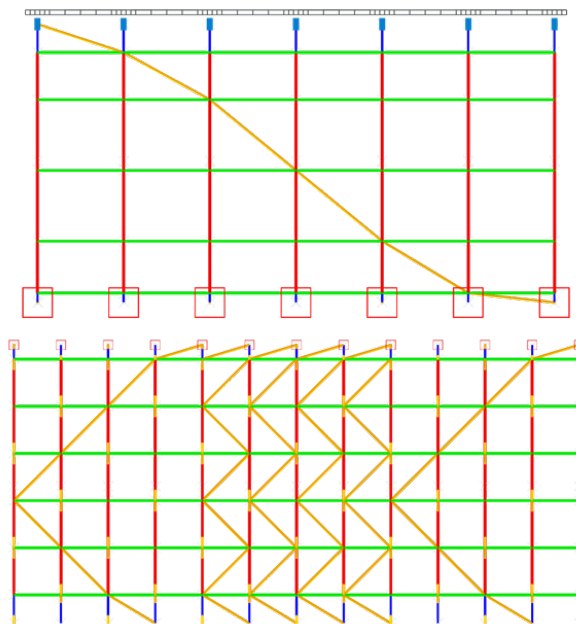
Bracing arrangement along the width of the falsework towers (reference model).
